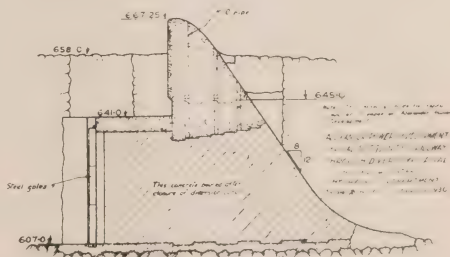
Section through Sluiceways at Outlet of Diversion Channel.
